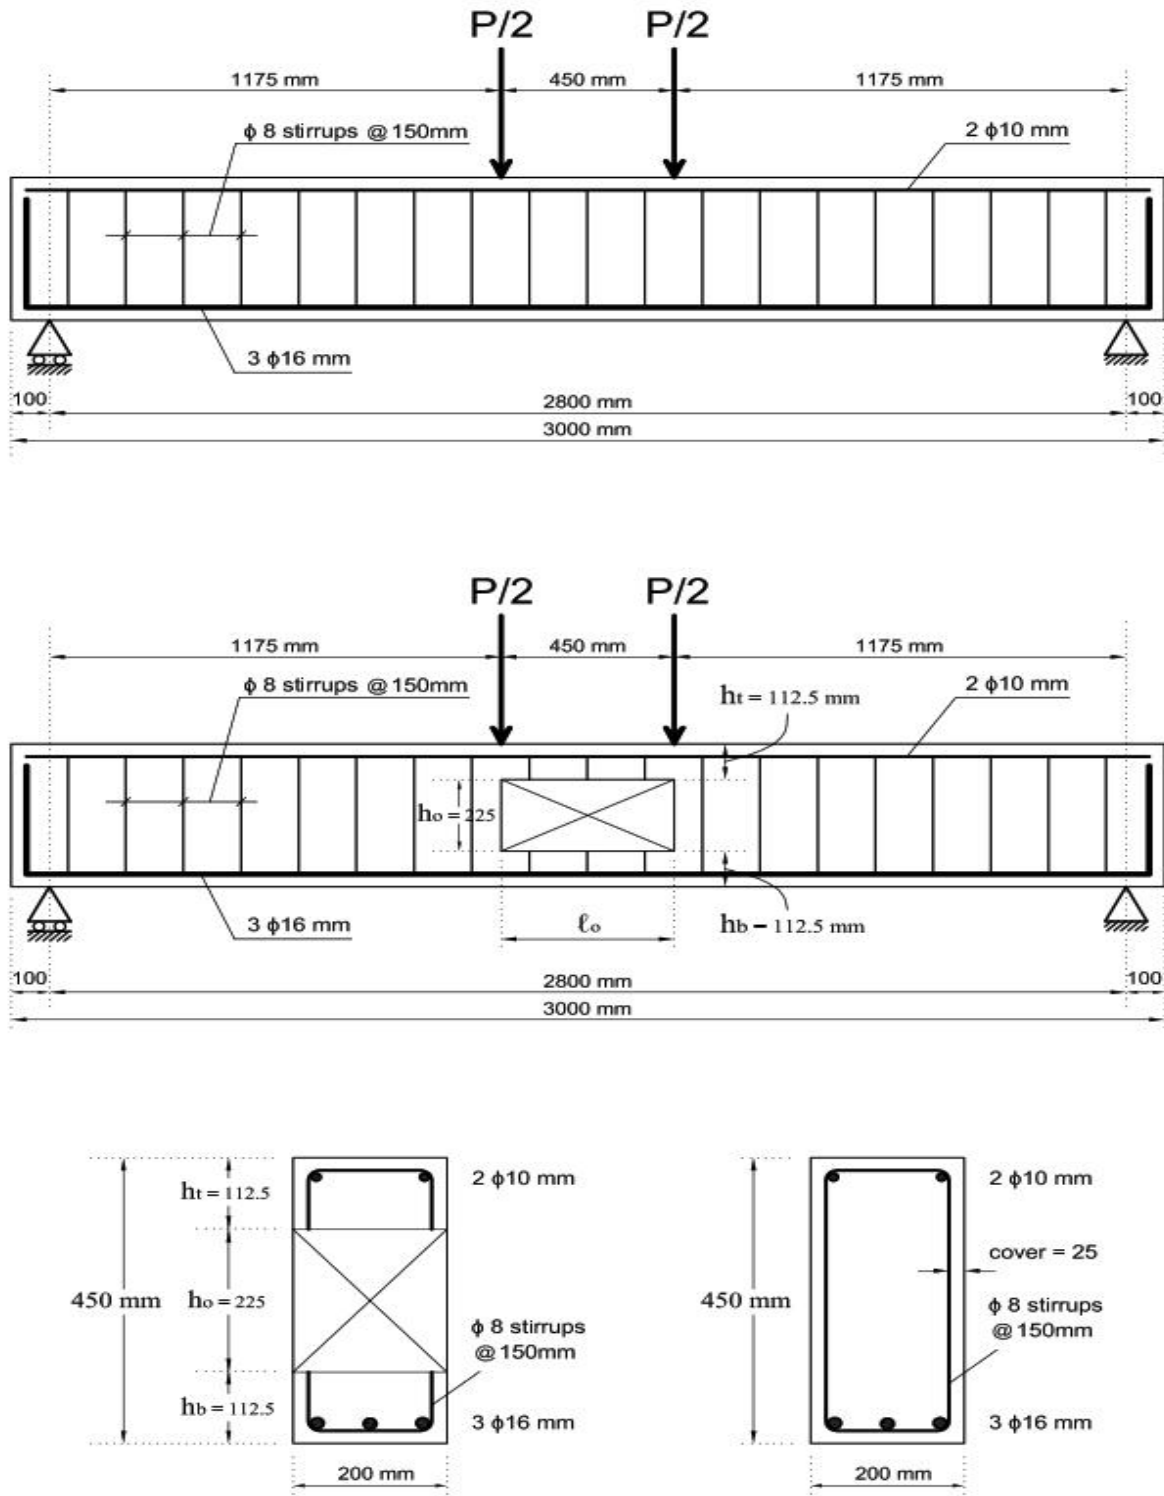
Details of unstrengthened beams with 4-point bending: (a) elevation of beam without opening, (b) elevation of beam with an opening, (c) beam section within solid parts, (d) beam section within opening location.
